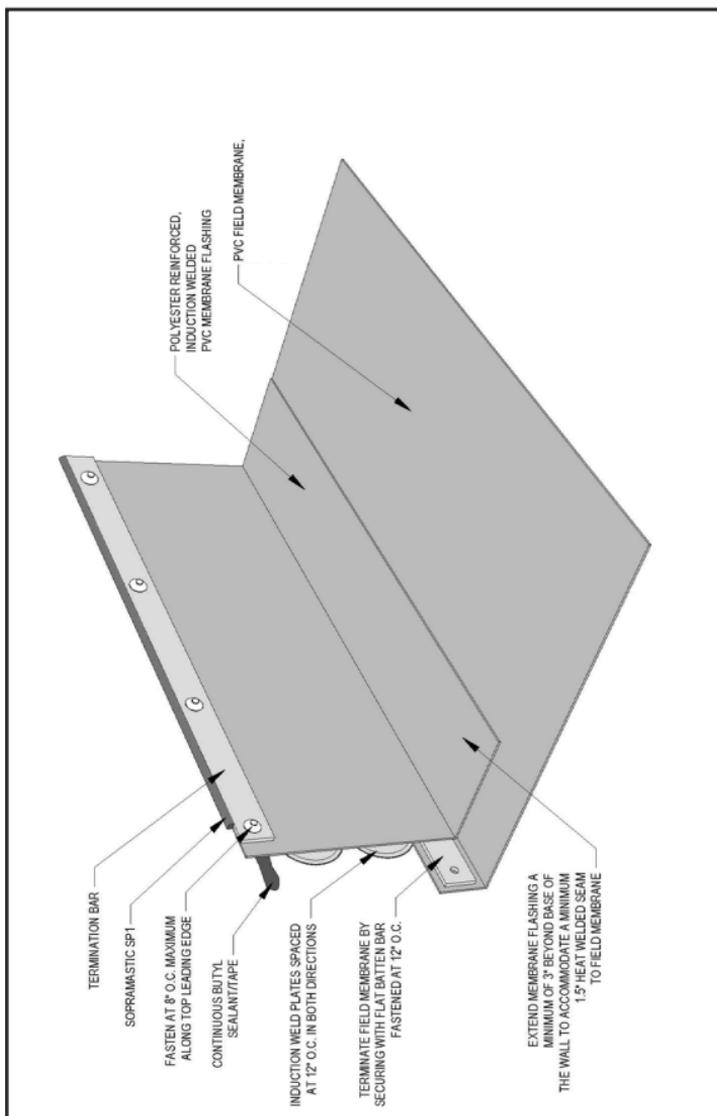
Induction Welded PVC Flashing Membrane At Wall/Curb With Vertical Perimeter Fastening
